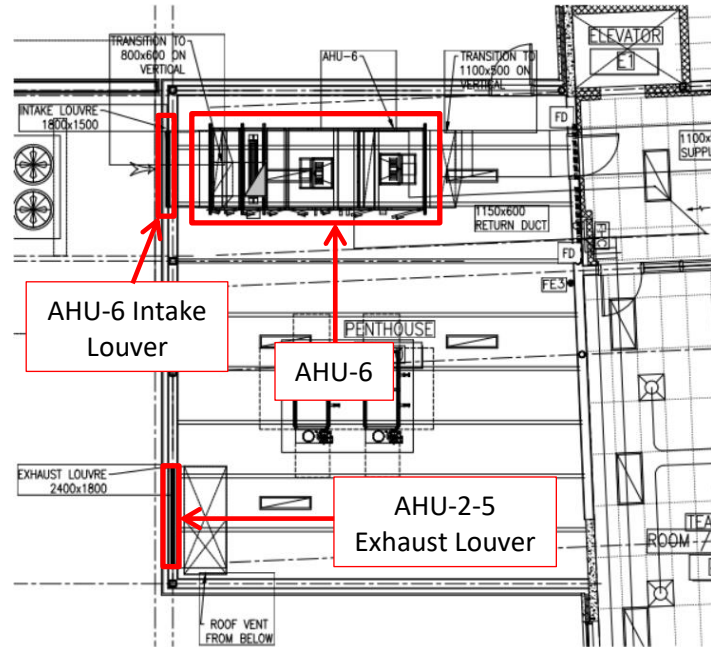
Fourth floor mechanical penthouse plan showing location of considered equipment.
